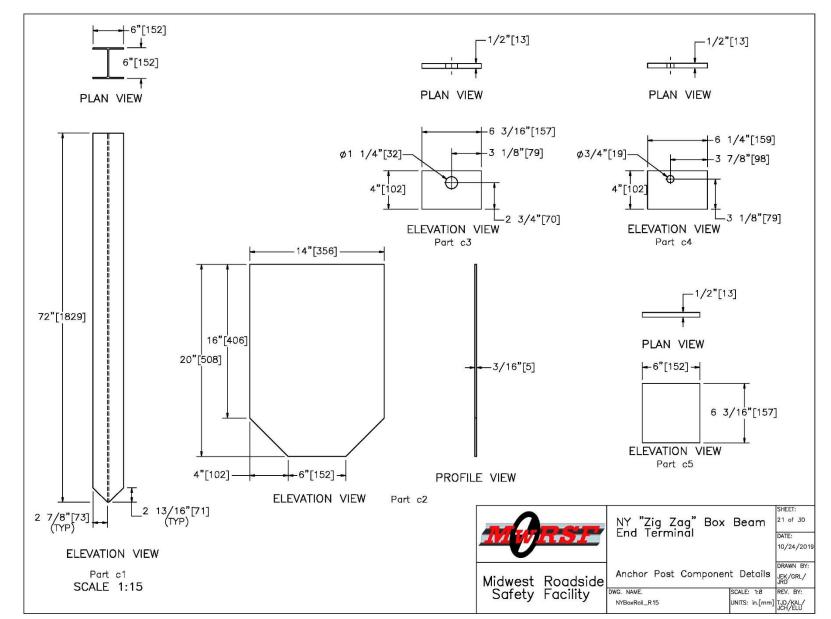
HFT Anchor Component Details, Test No. NYT-1
